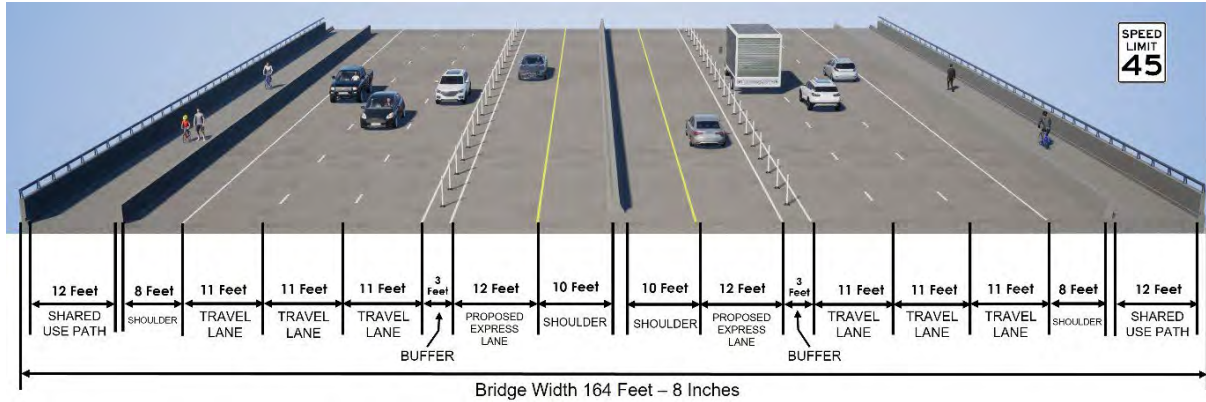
Preferred Roadway Typical Section: DeSoto Bridge
